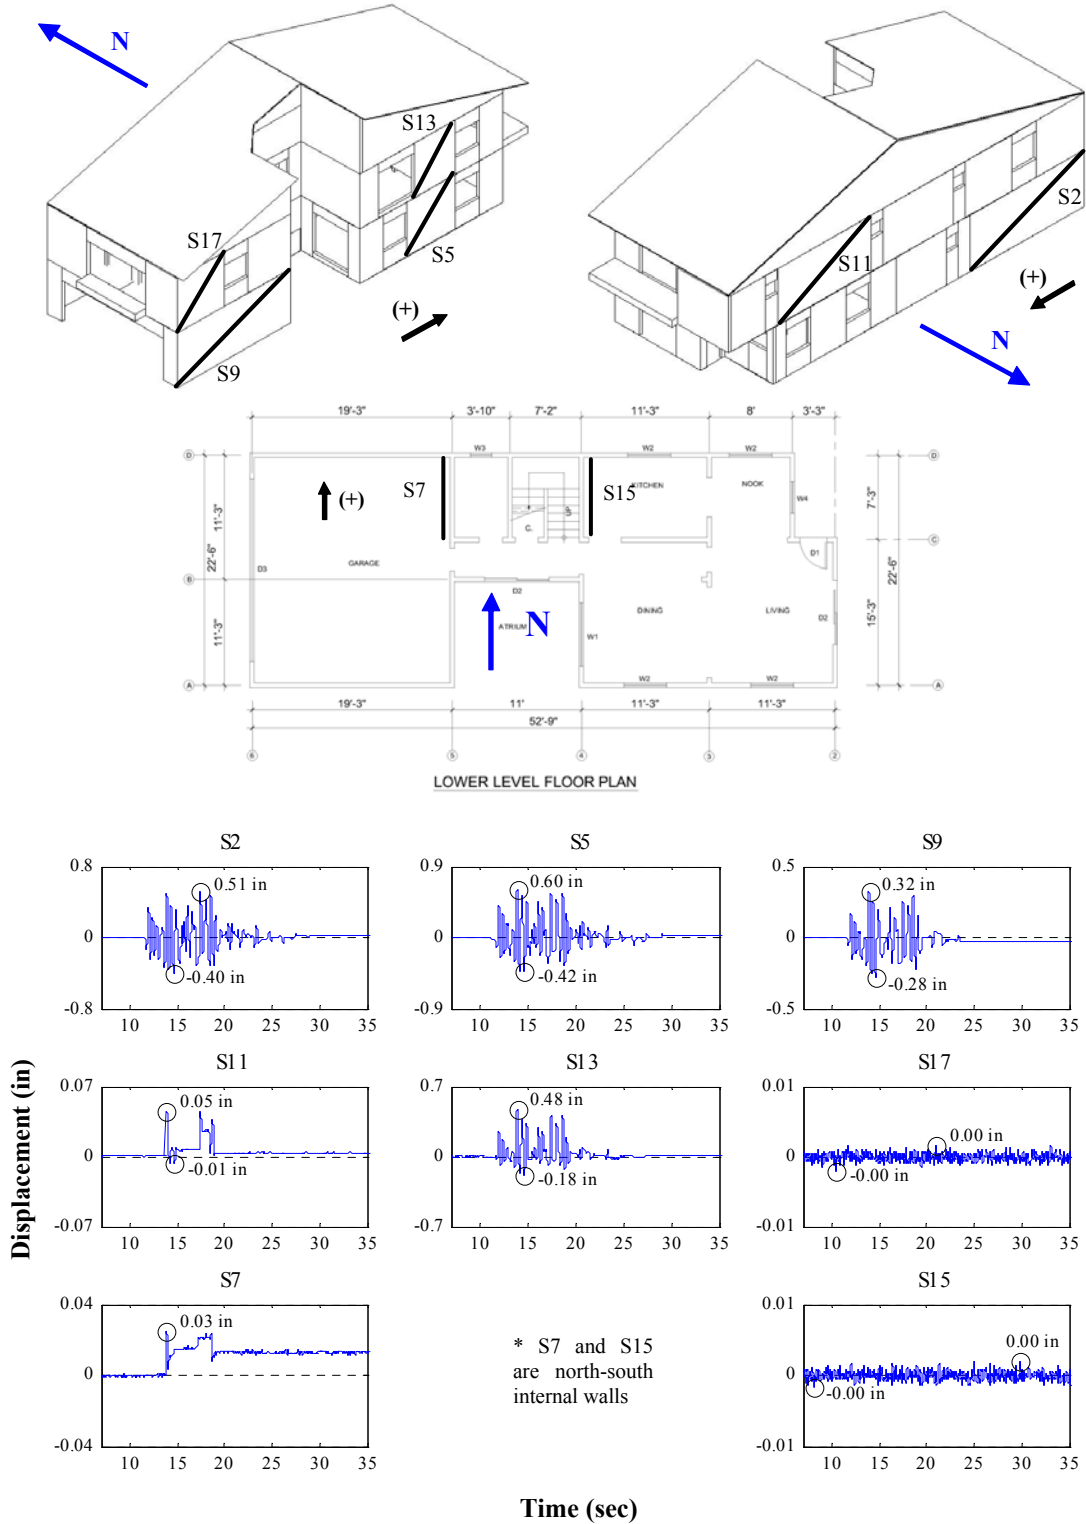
Wall deformations of east-west internal walls for Test NWP2S29
